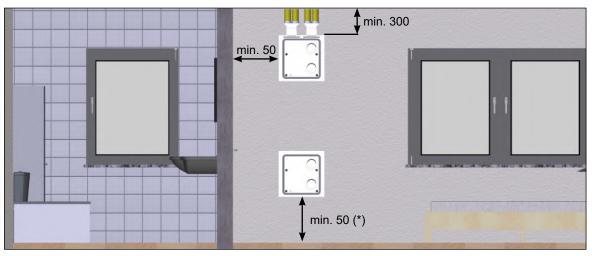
Minimum distances and options for positioning the M-WRG-M/MB-FR75/1 / FR75/2 installation kit, dimensions in millimetres
